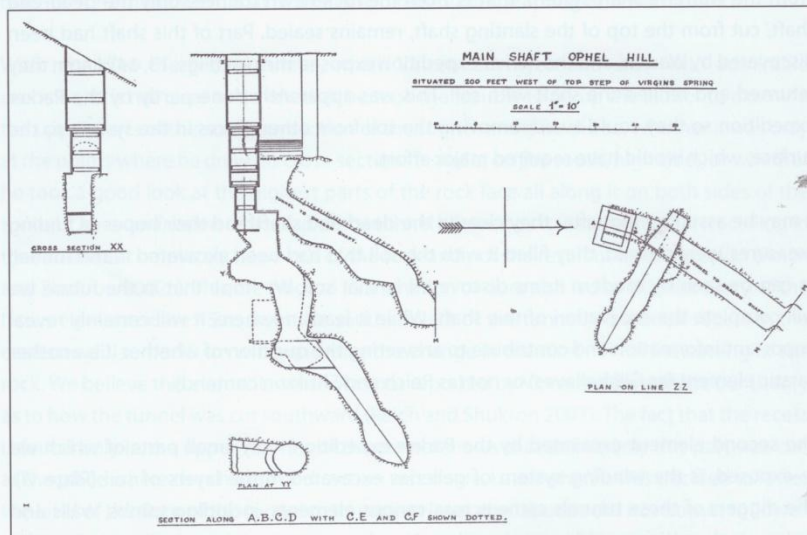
The 'dead-end shaft,' plan and cross-section, 1911, Pl. IIIc.
